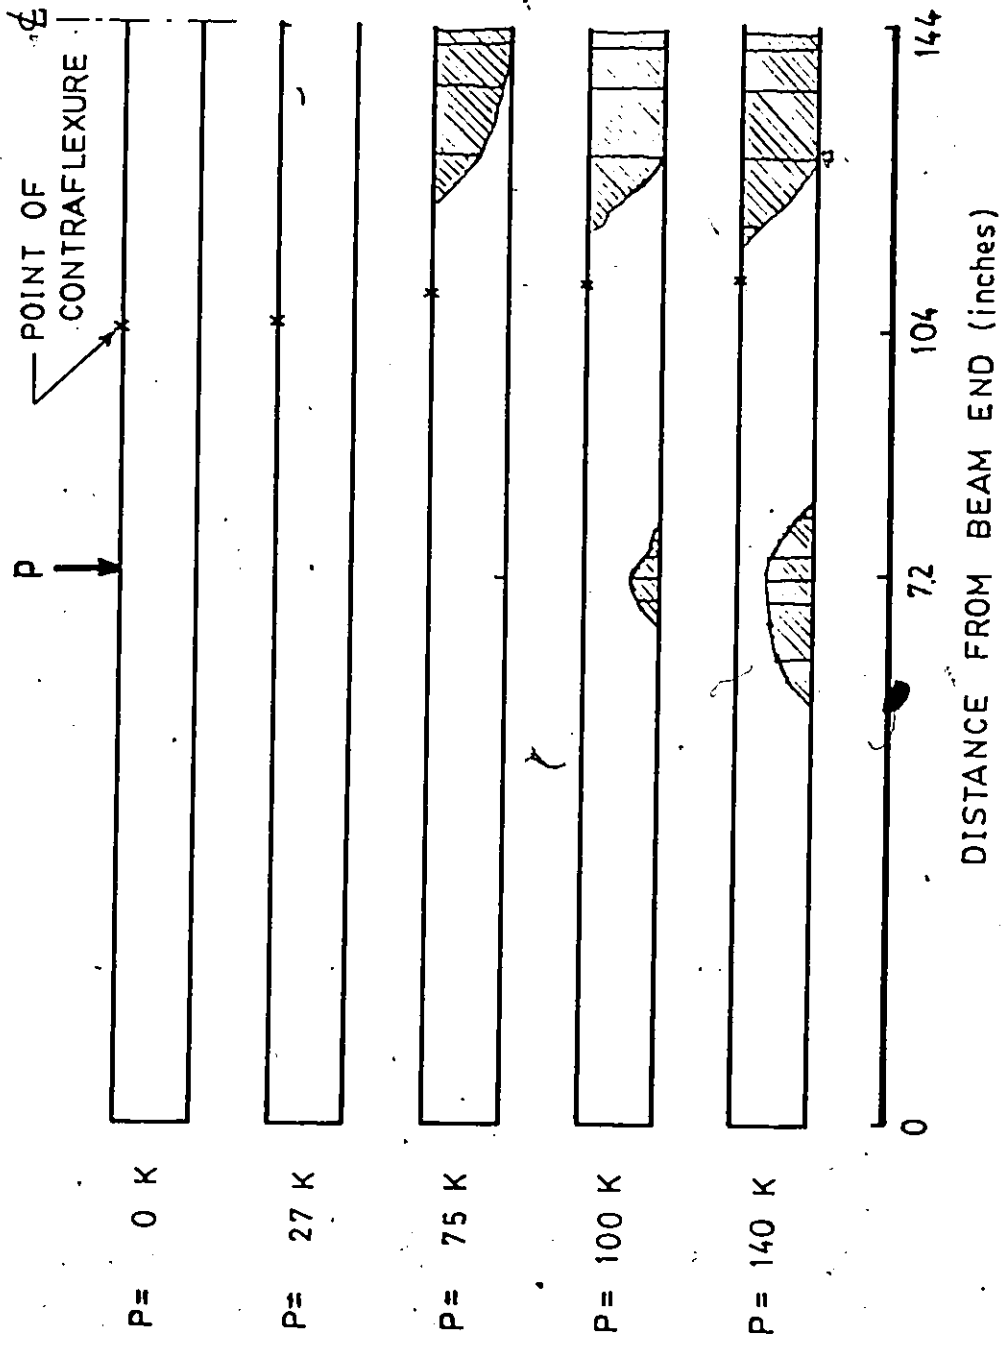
APPROX. CRACK PROPAGATION IN CONCRETE SLAB FOR BEAM CB1
